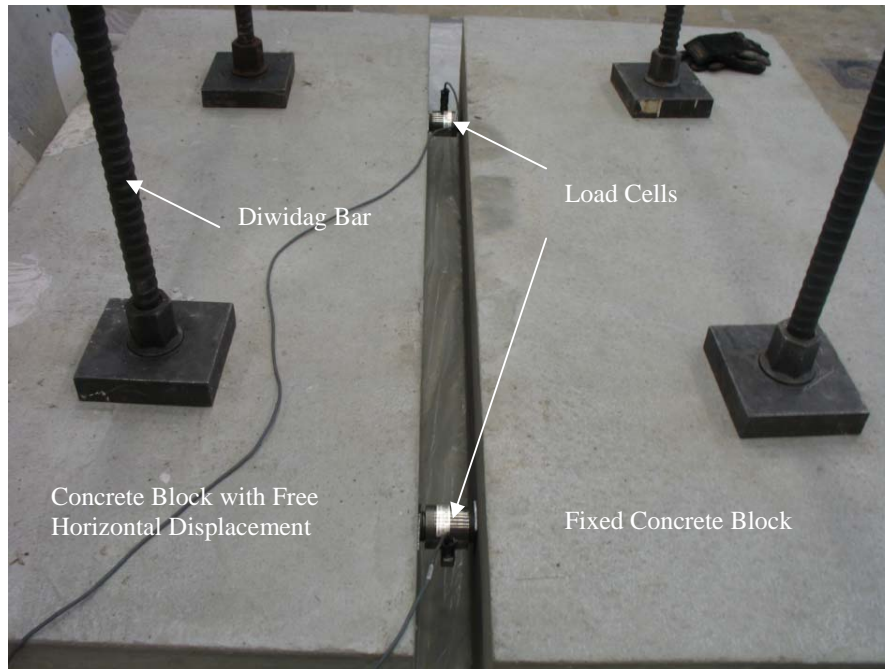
Photo of Concrete Block Assembly in the North Side
